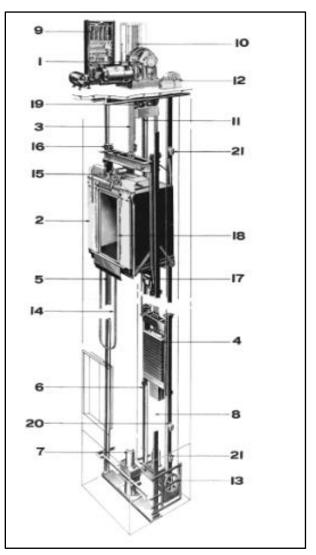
Typical passenger traction elevator (Otis Elevator Co)
